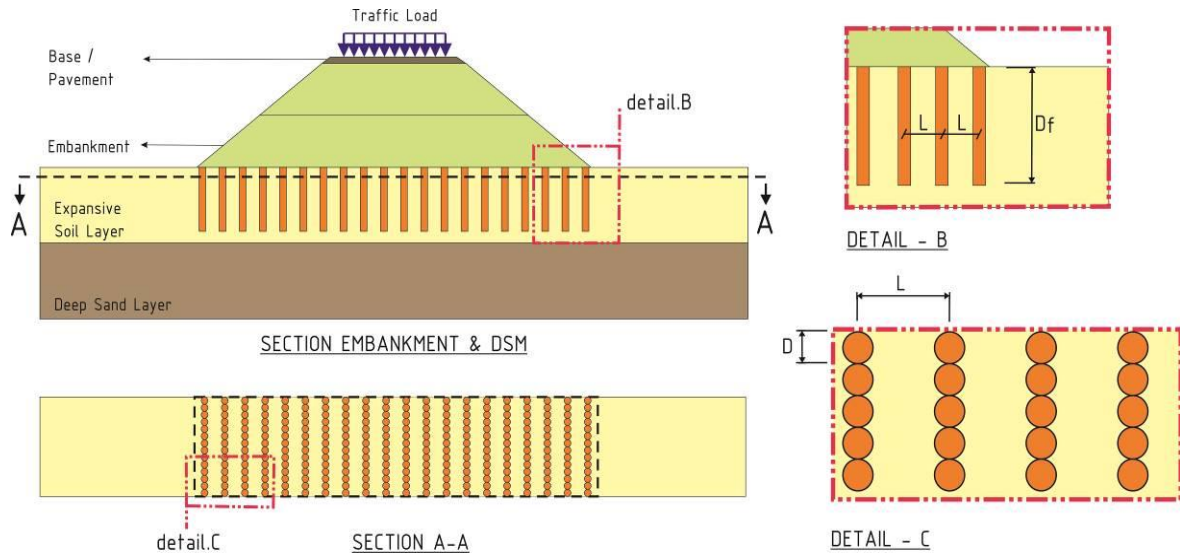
Case study of embankment, construction road, and deep soil mixing column
